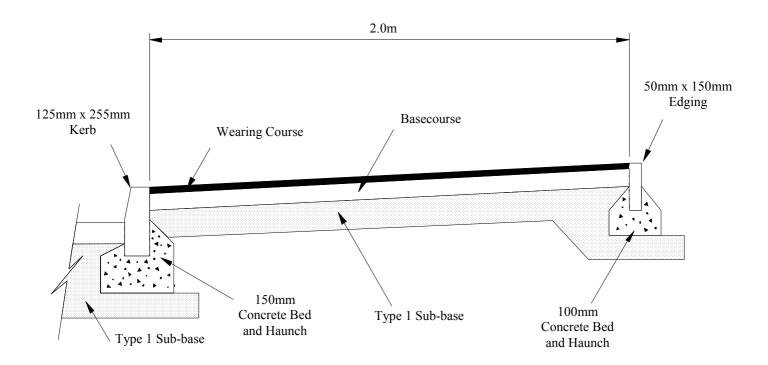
Typical Pedestrian-only Footway Cross-section
